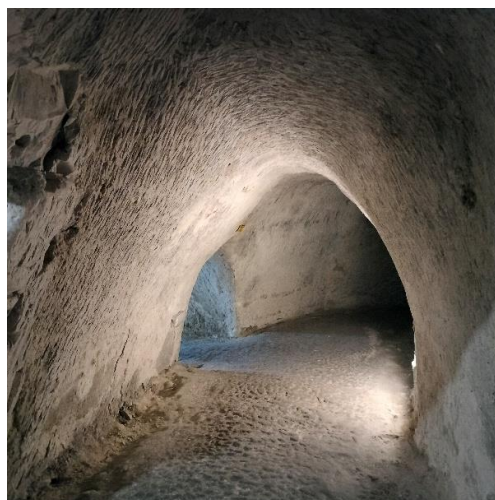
Chalk excavation (photo by J. Kiszczyk)
